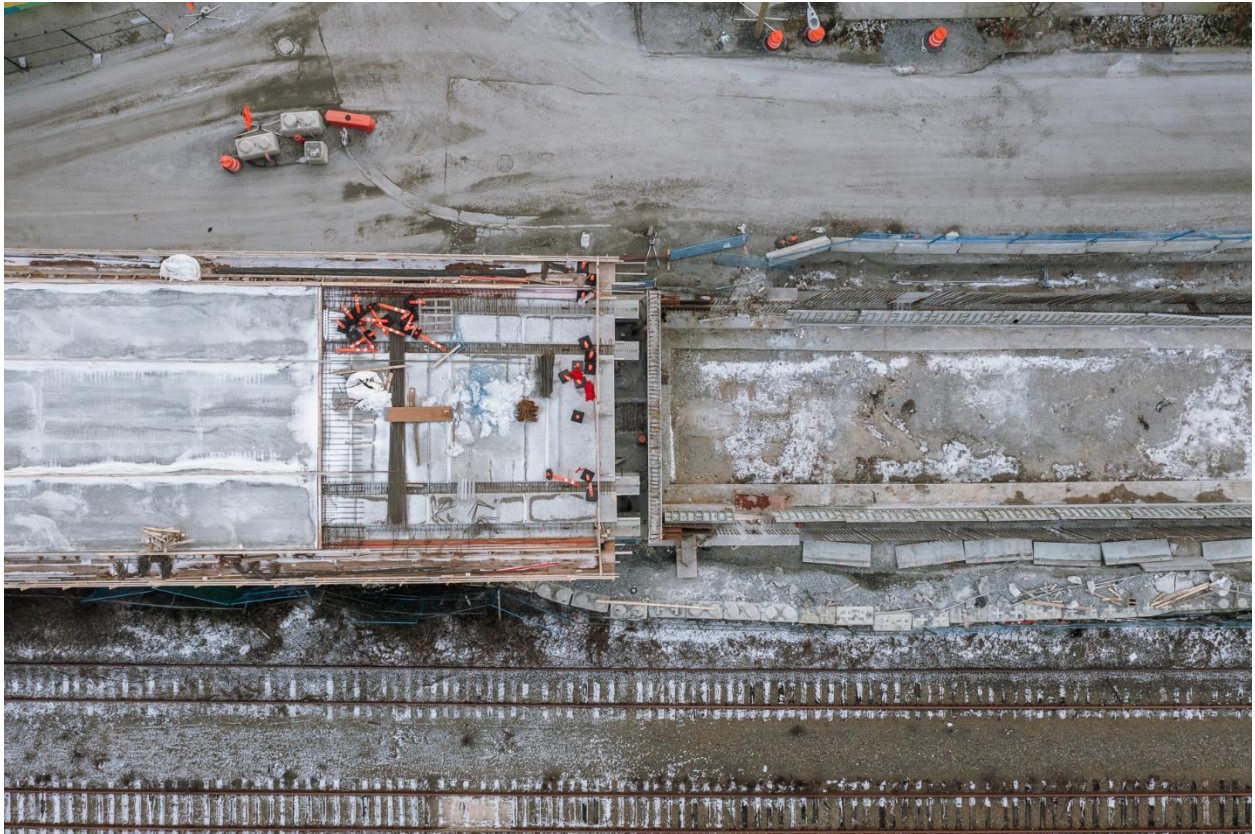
Elevated Guideway: Progressing with the construction of the abutment structure.
